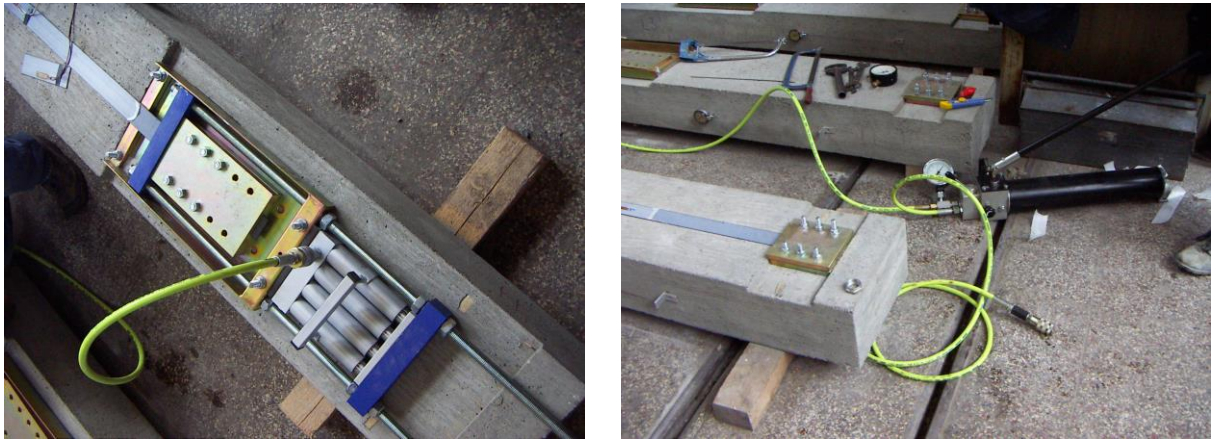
Detail drawing gun, (four coupled piston all of piece) and mechanical piston.
